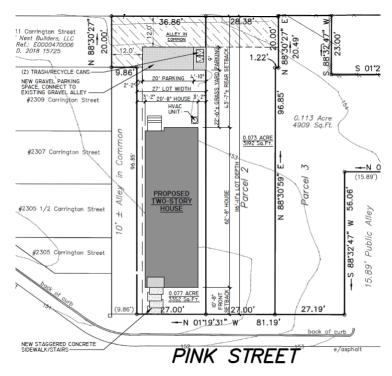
Plan of proposed parcel layout and proposed dwelling along Pink Street
